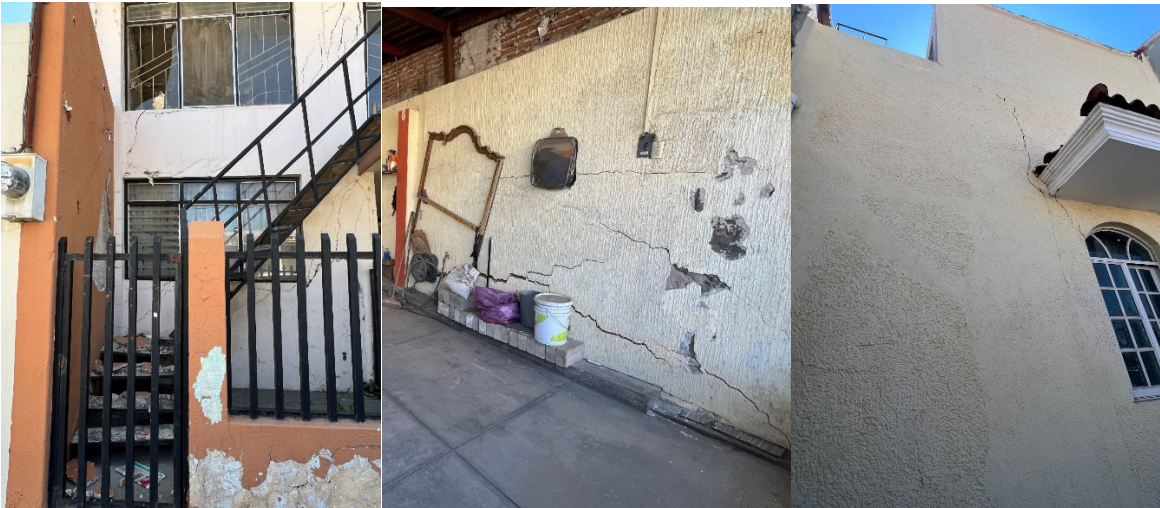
Severe damage in three continuous houses with extensive cracking on walls, floor lifting, and tilt of columns, Ciudad Guzman, Jalisco.
